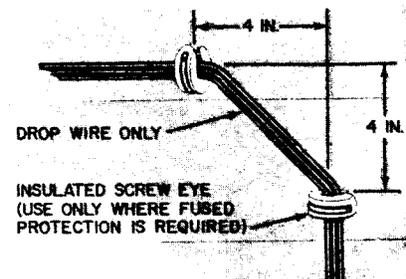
Spacing Insulated Screw Eye When Changing Direction of Wire Run
